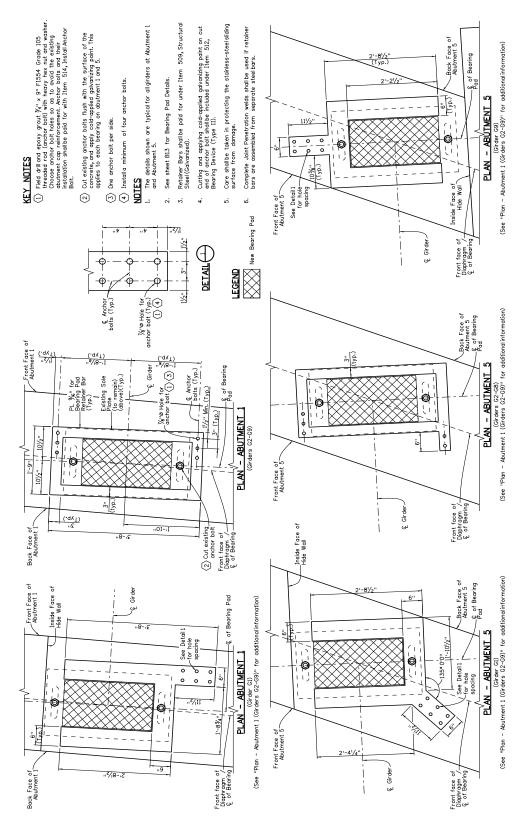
(M)-5 Sample Details for Bearing Keeper
